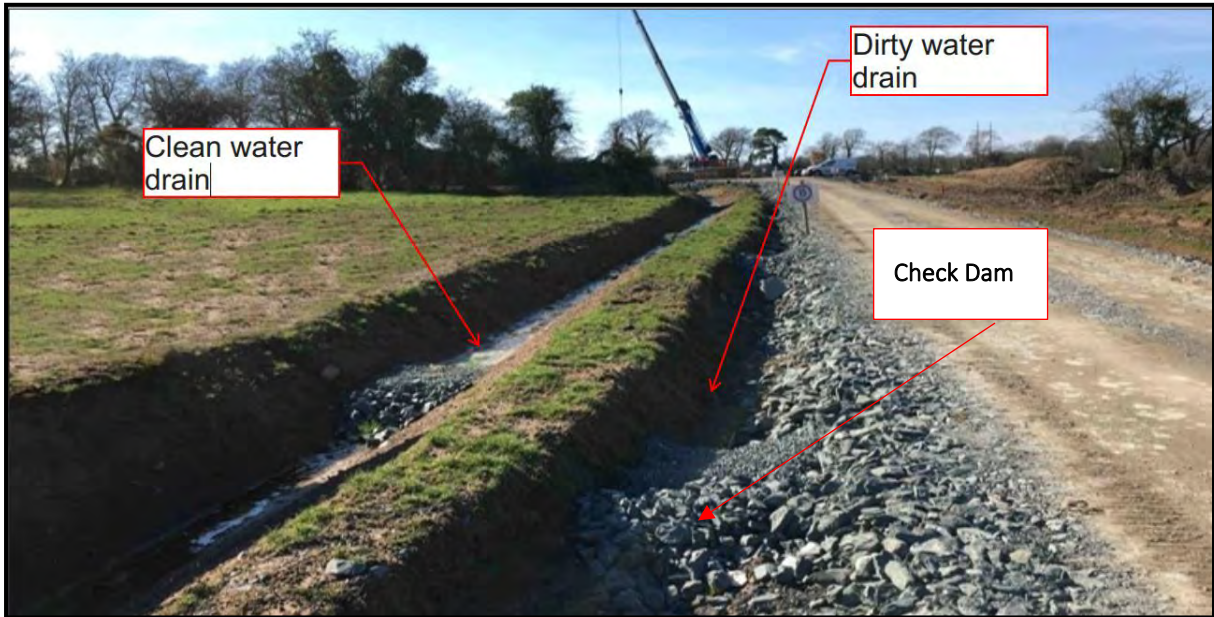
Separation of clean and dirty water drainage on a substation site
